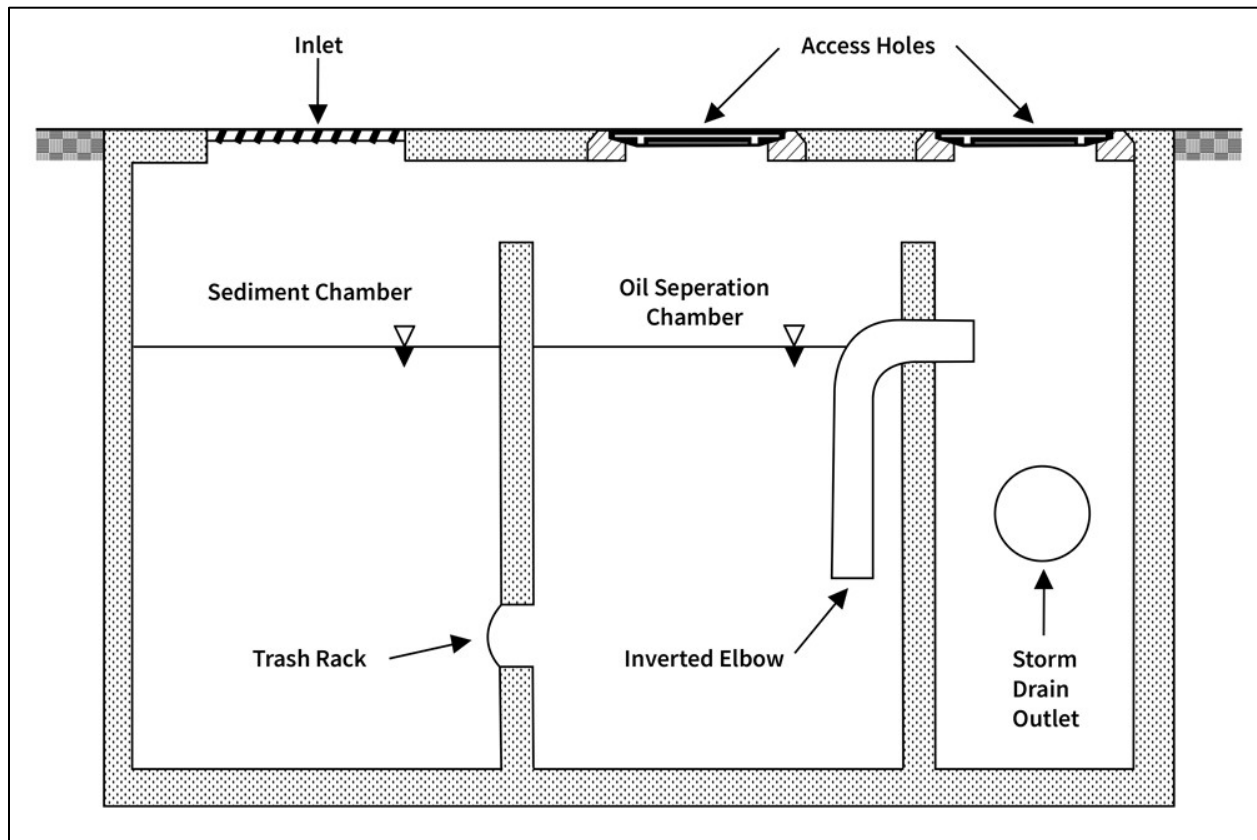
Cross-section detail of a typical oil/grit separator.
